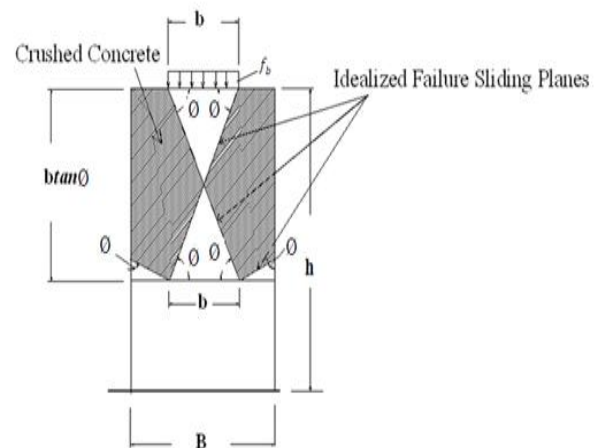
Proposed approximate final failure pattern of concrete block under local bearing pressure.
